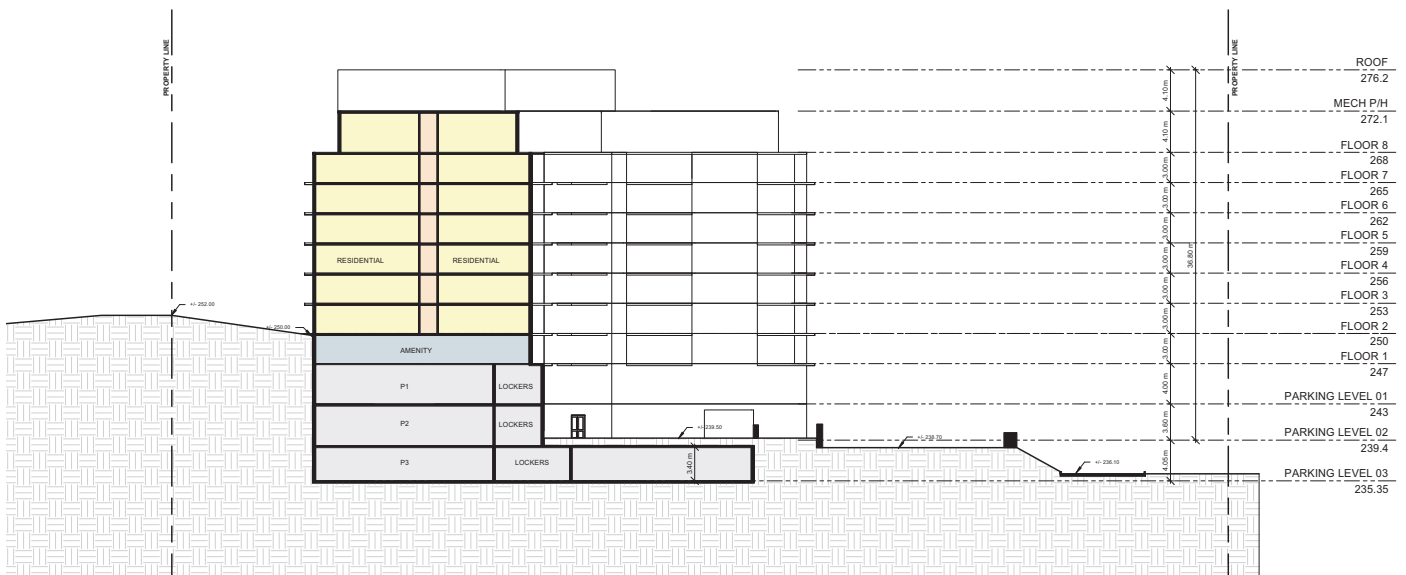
Site cross section looking west prepared by Turner Fleischer Architects Inc.
